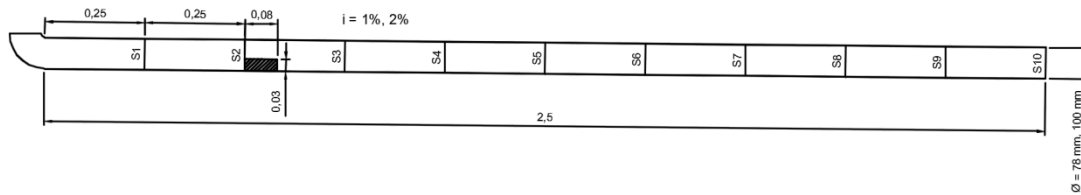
Configuration of the horizontal drain pipe of a 6 liters water closet
